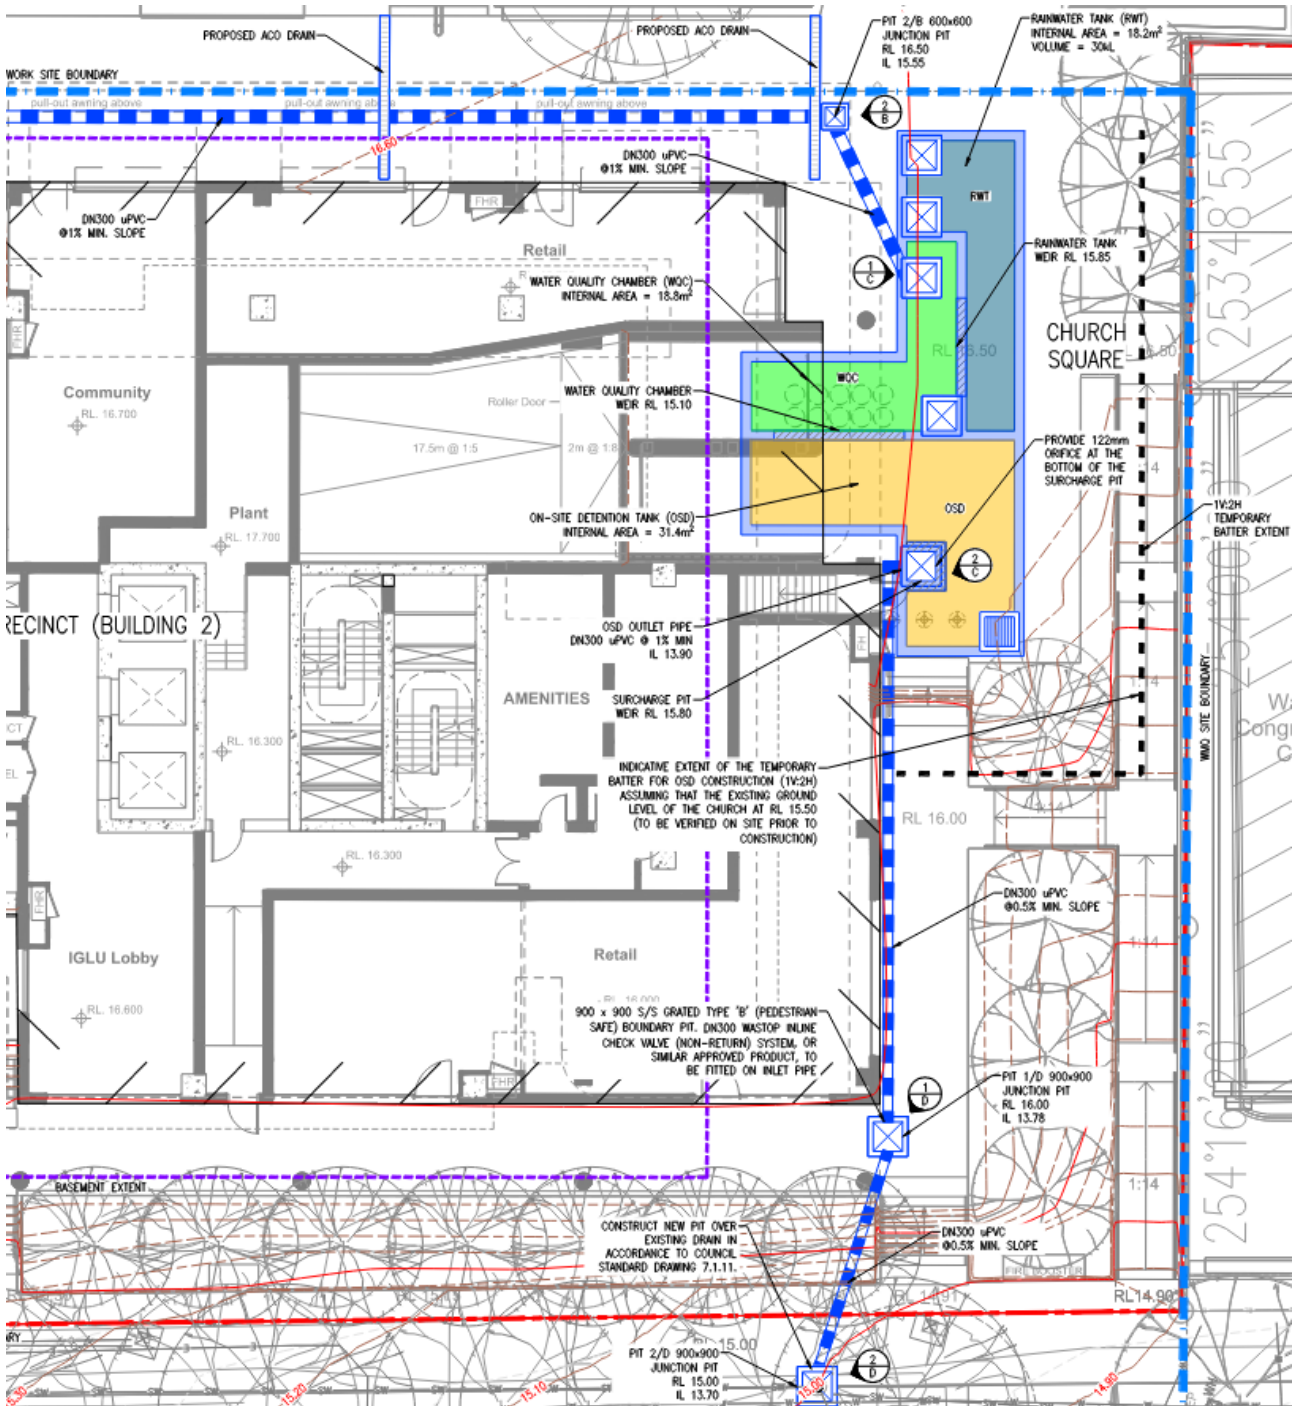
Proposed Stormwater Design - Central Precinct Building 2. Drawing WMQ-BD2-RBG-CV-DRG-C8261 (Appendix A-4).
